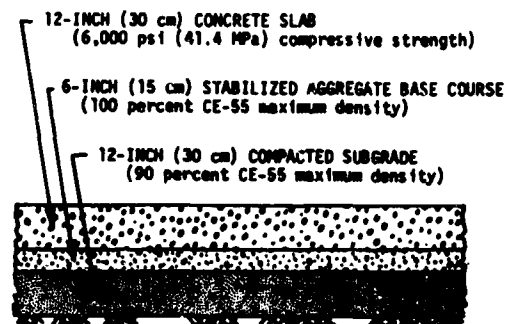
Typical runway cross-section, site C-72, Eglin AFB, FL.
